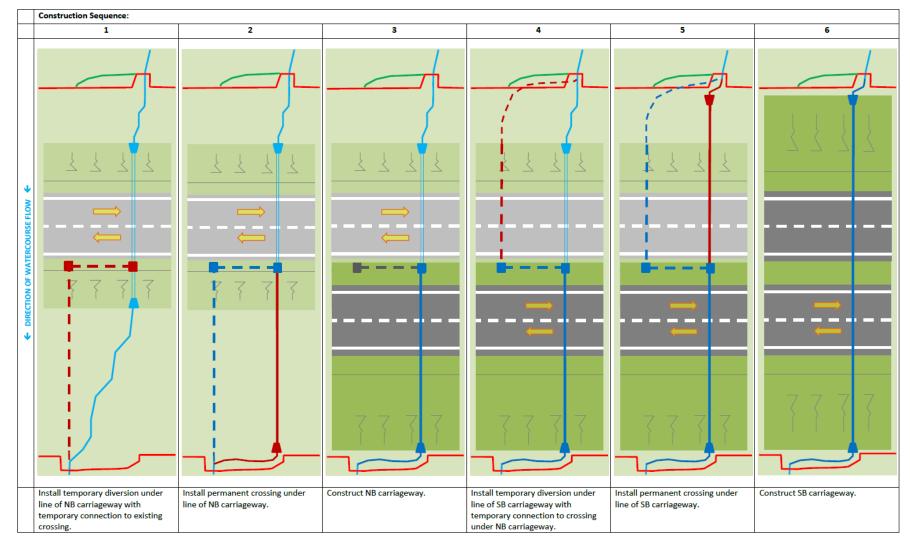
Widening to the west – road on embankment – on-line watercourse alignment
